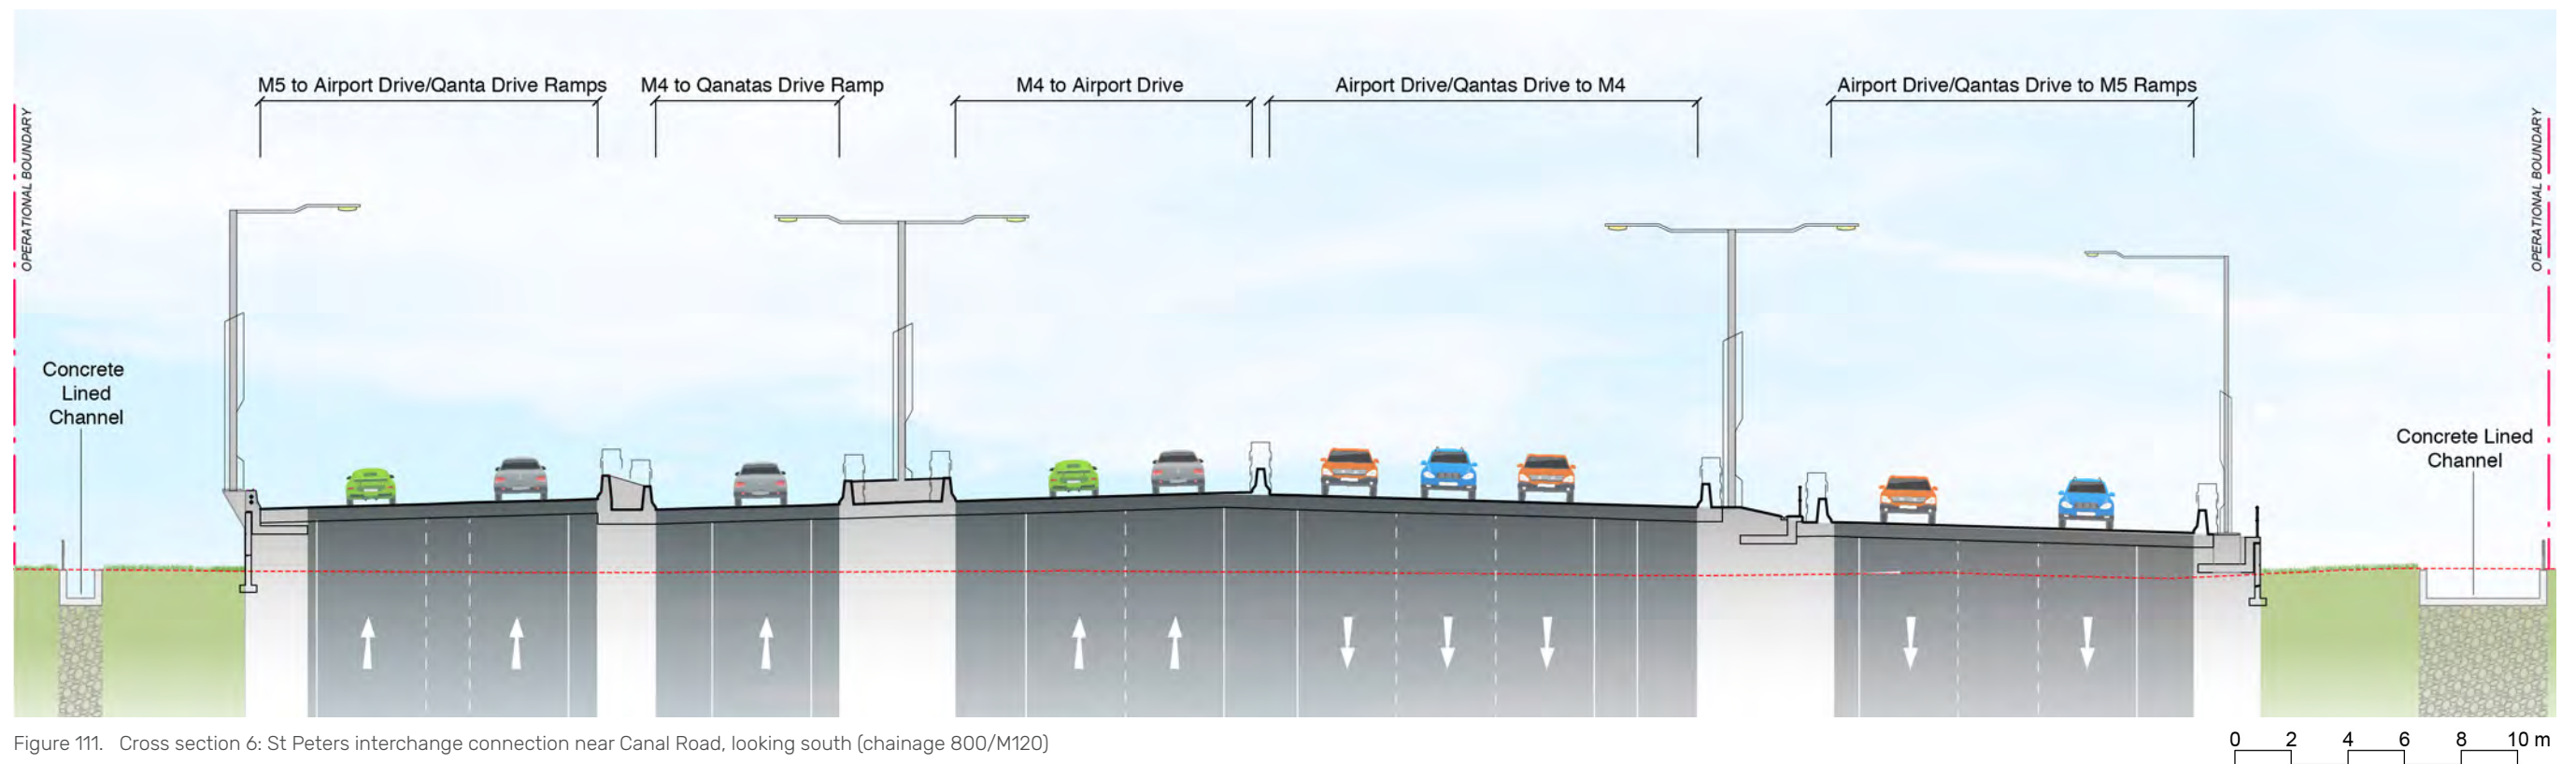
Cross section 6: St Peters interchange connection near Canal Road, looking south (chainage 800/M120)
